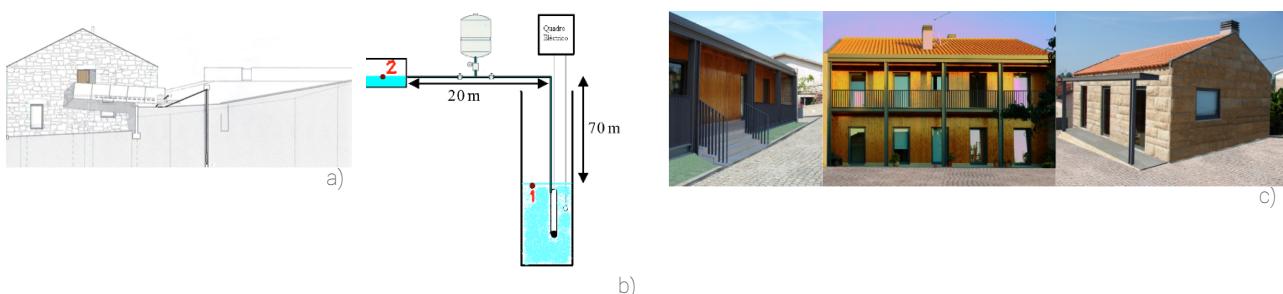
Scheme of a water supply system: from a hole (70 m deep) with a submersible centrifugal pump to an independent house with 2 floors and outhouse: house, hole and reservoir (a); detail of the supply system: pump, piping and reservoir (b); view of the house (front, back, outhouse) (c) (Ribeiro, and Martinho, 2012)
